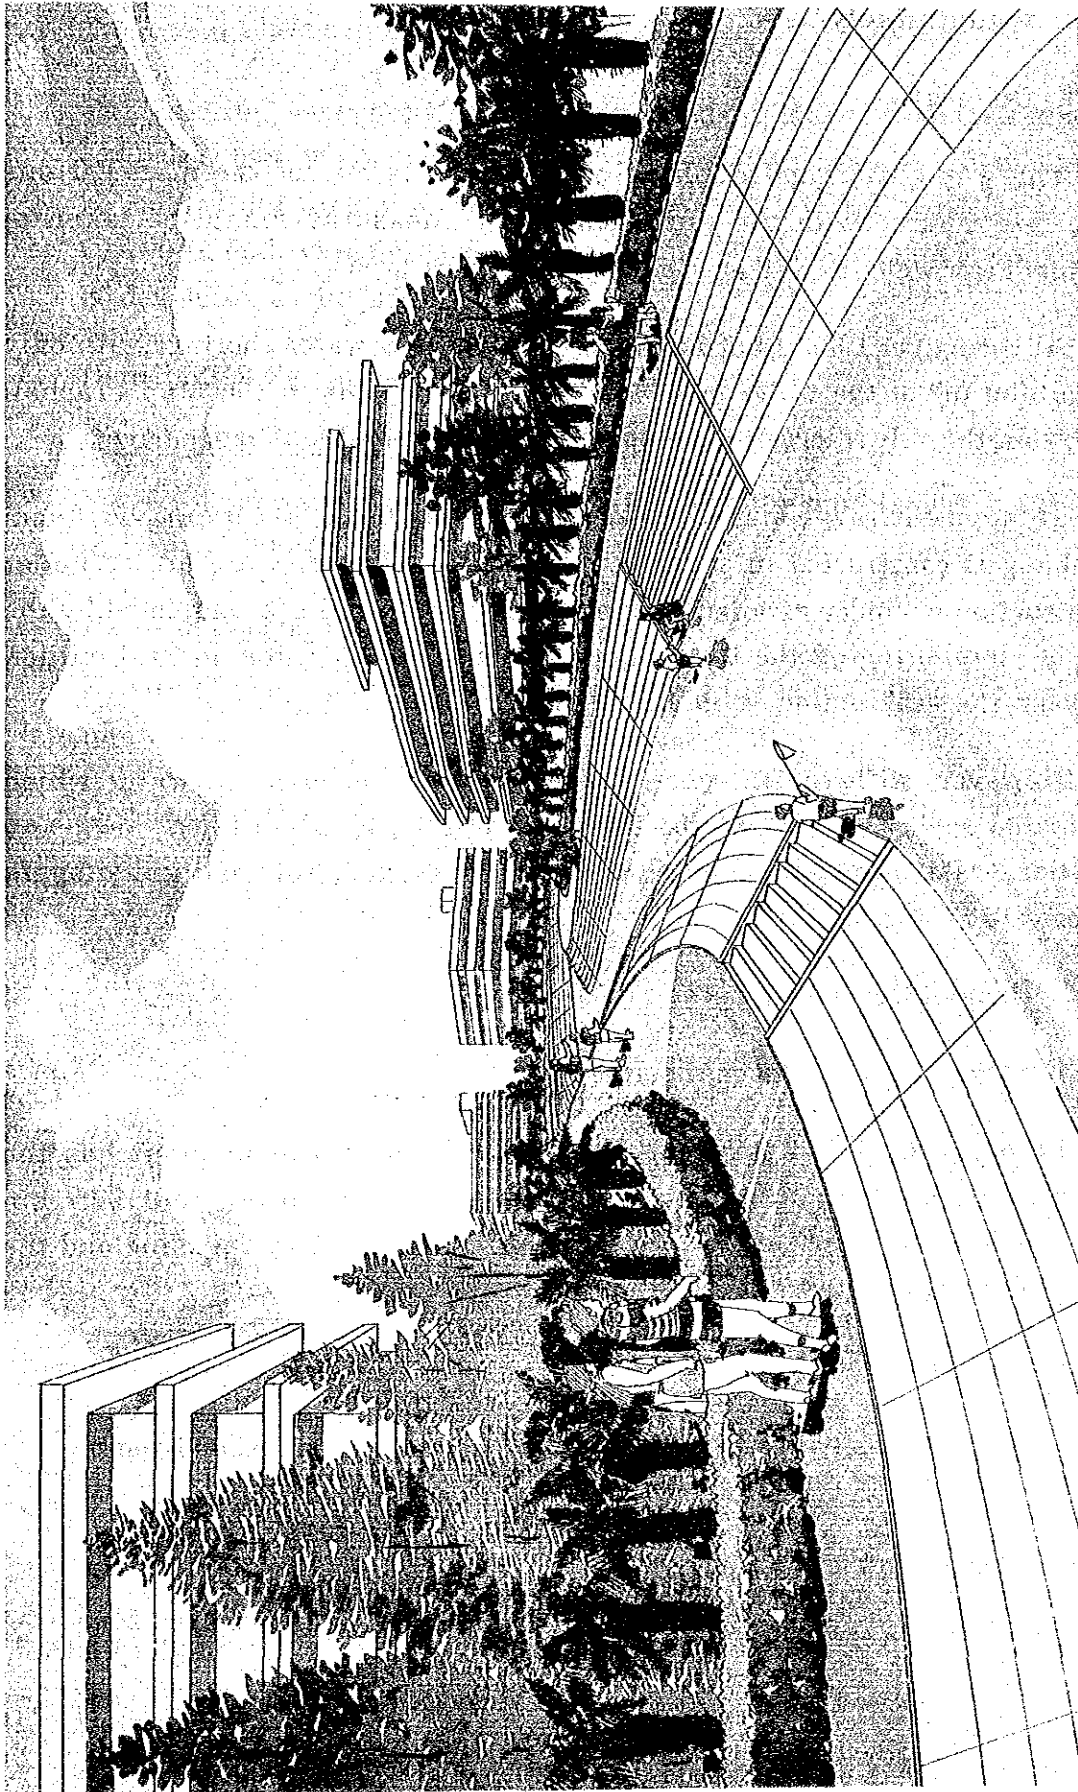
Phatthaya Canal Improvement Plan
